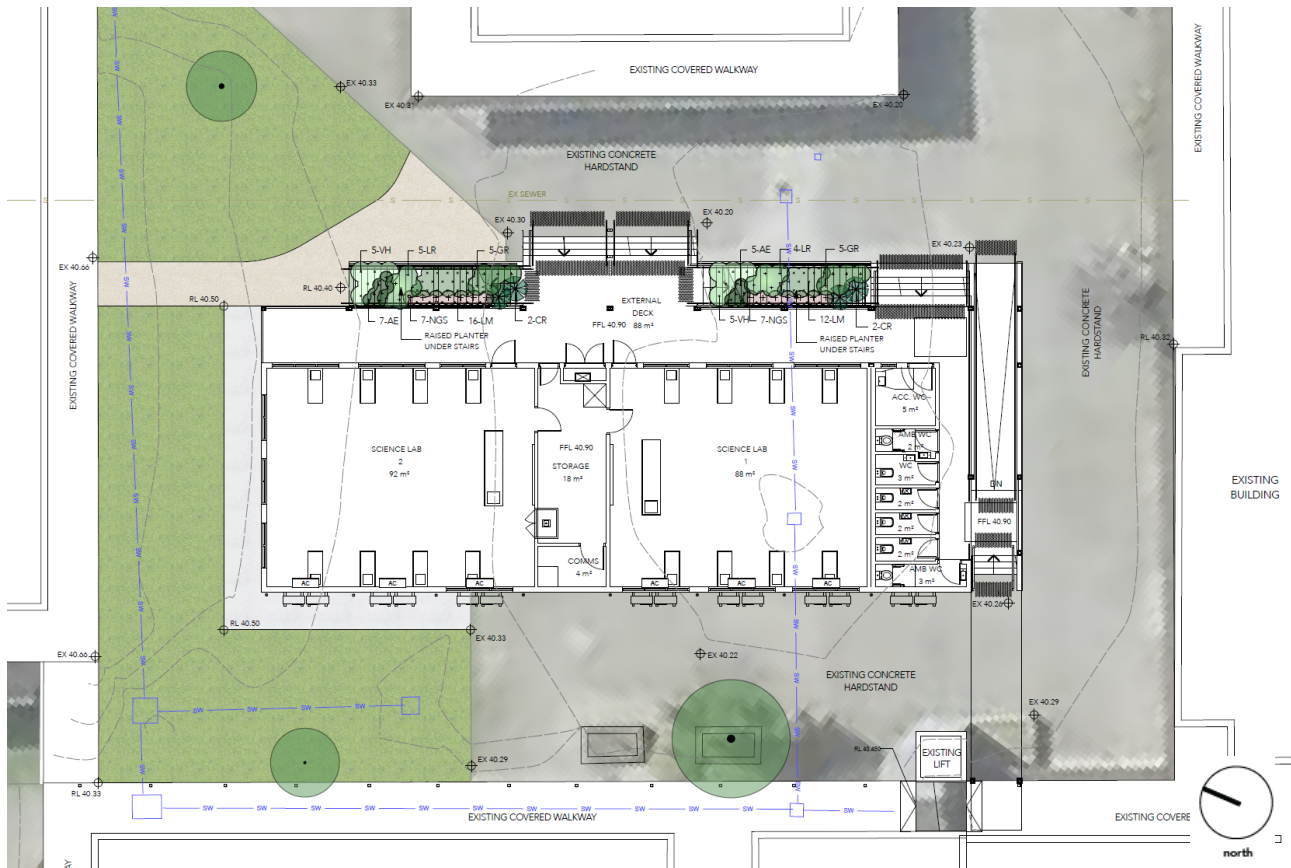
Proposed landscape plan (Source: Studio 151 Landscape Architecture)
